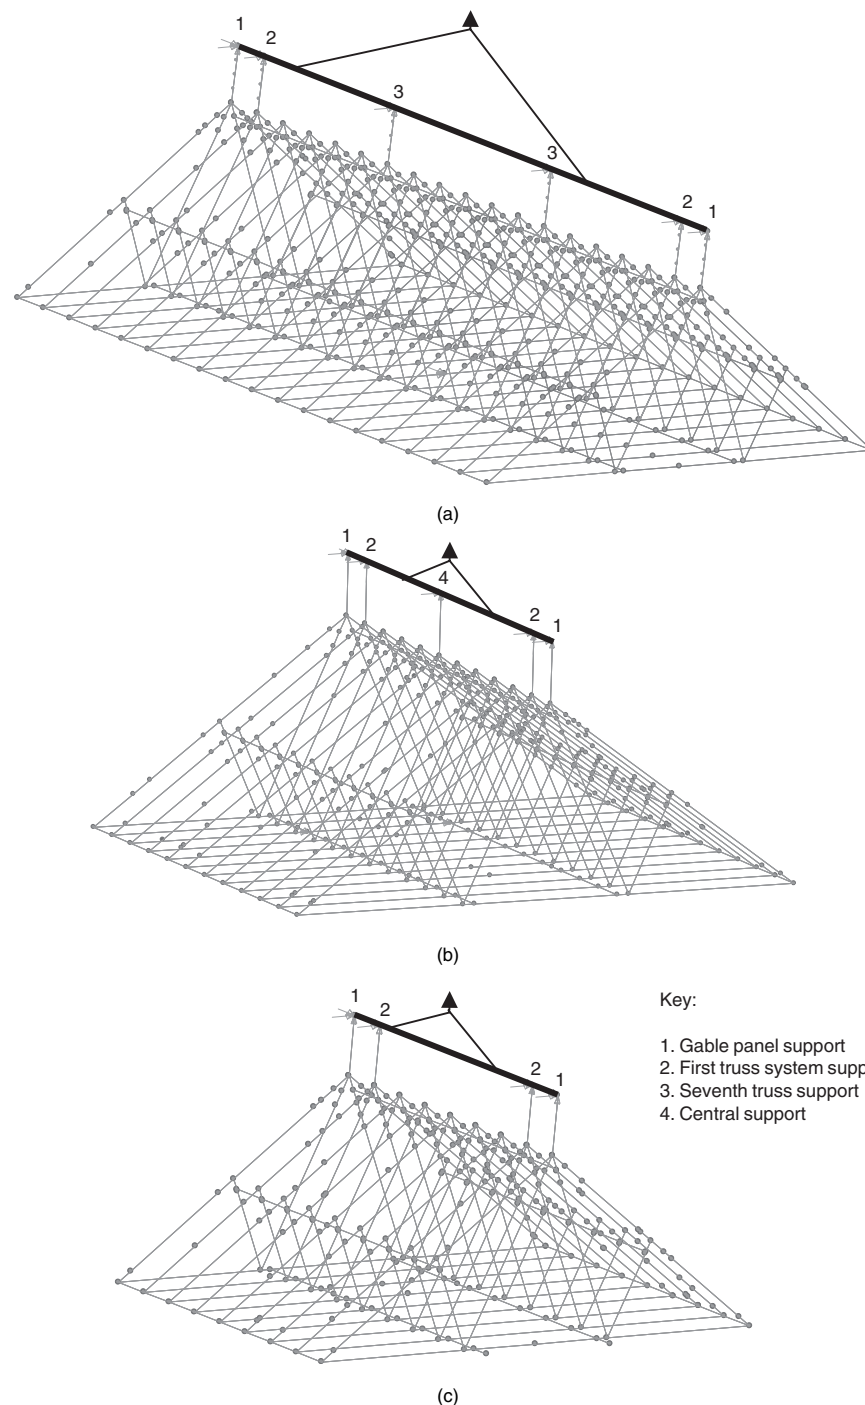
Optimal lifting points: (a) large system with more than ten trusses; (b) medium-size system with seven to ten trusses; (c) small system with less than seven trusses
